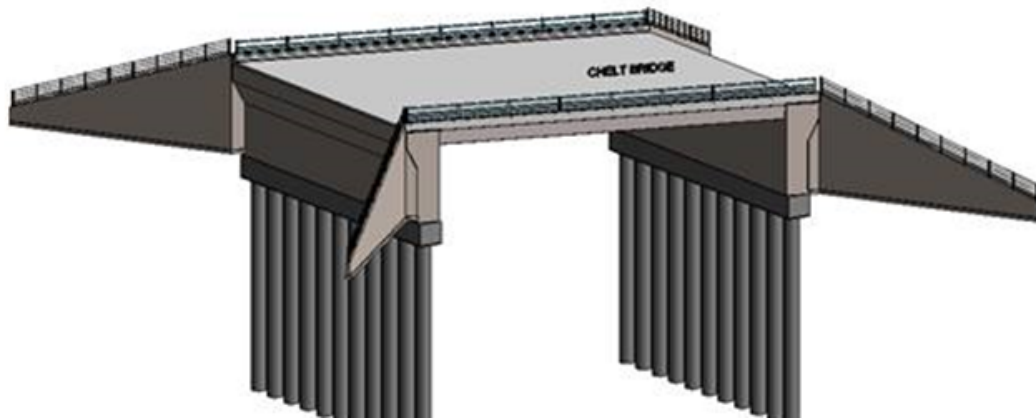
Schematic of Proposed River Chelt Bridge
